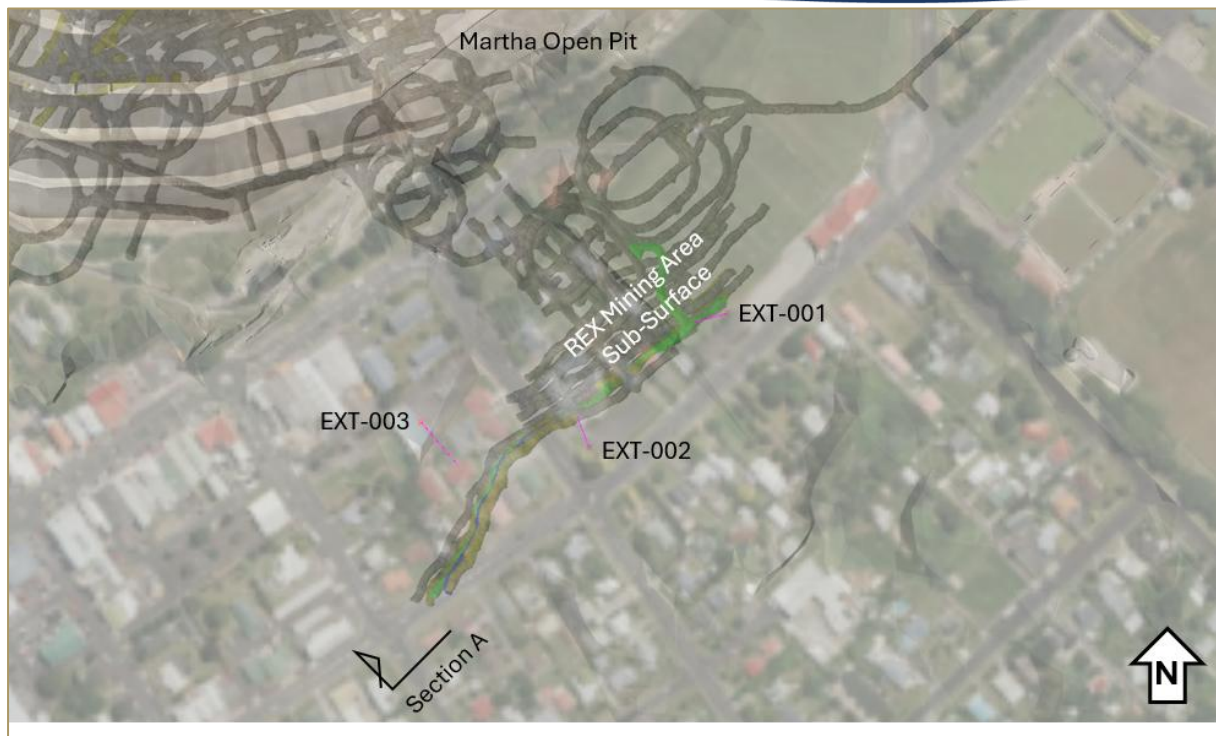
Extensometer Location Plan – spatial relationship to REX underground mining area.
